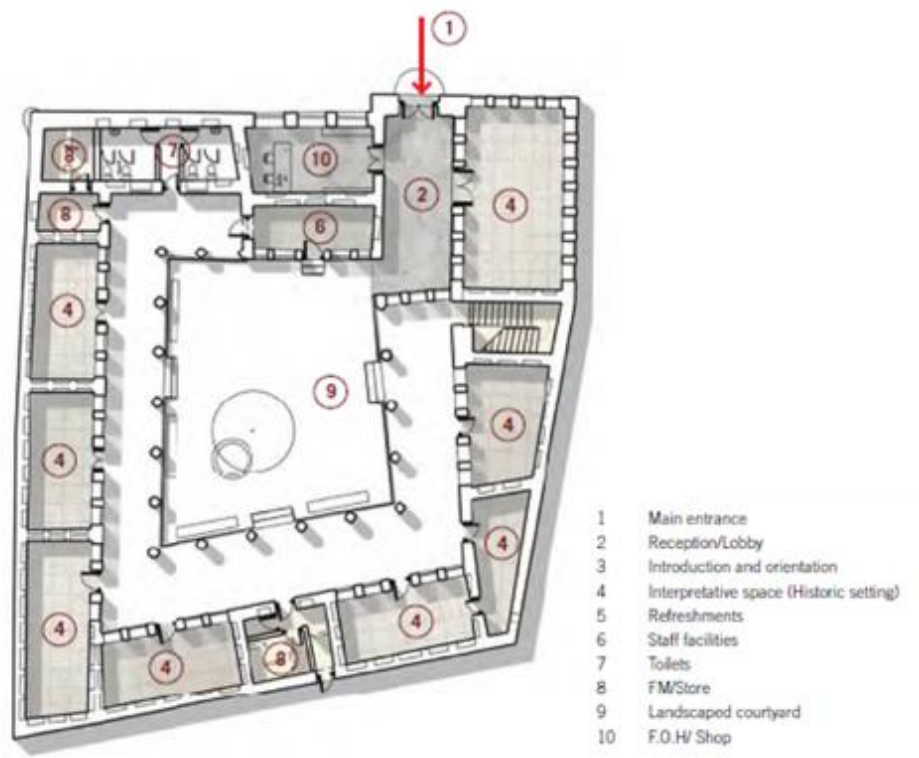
Bayt Radwani Proposed Ground Floor Plan (Source: Msheireb: Heritage Quarter Houses Schematic Design Report, 2011)
